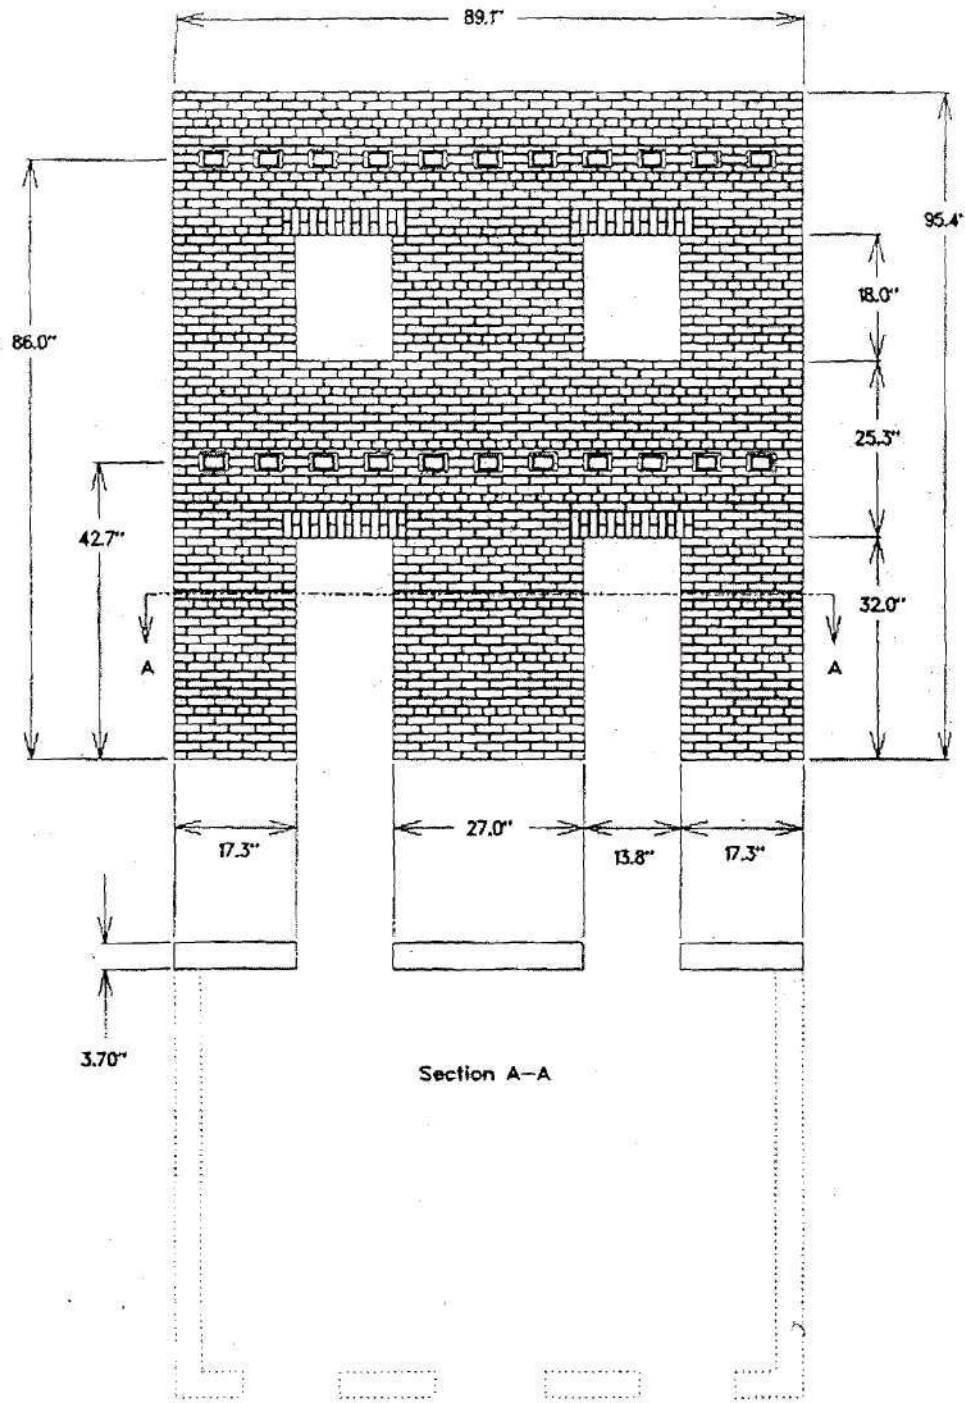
The test specimens Door wall in Costley's test (taken from Costley 1996)
